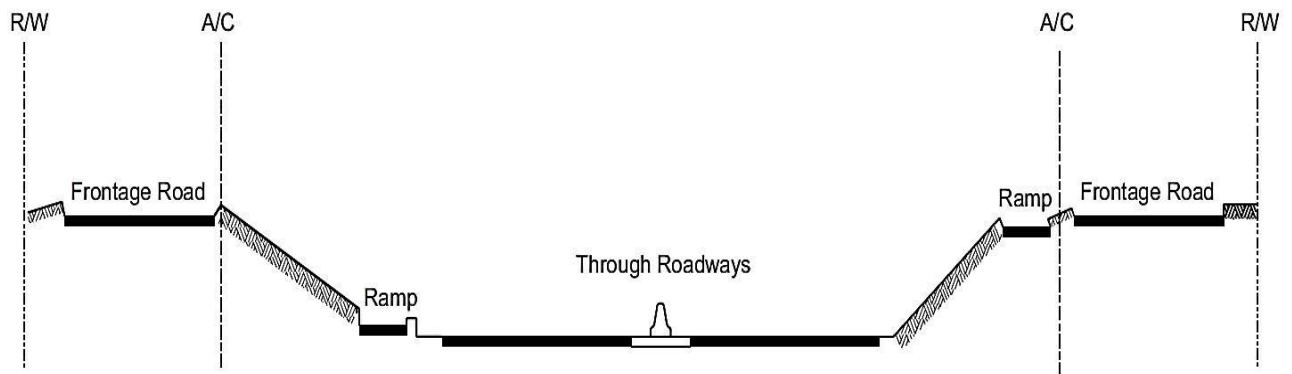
/2: Typical Cross Section for Depressed Freeways [1, p.8-13]
